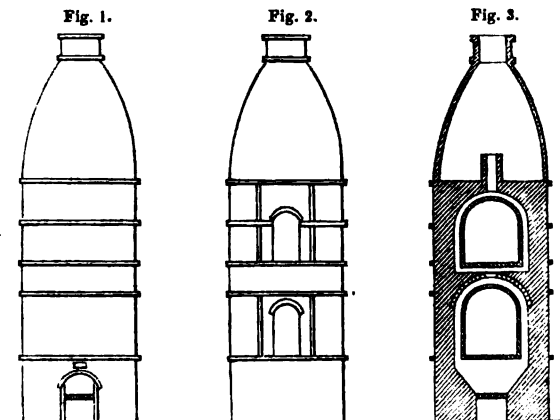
, is a front elevation ; fig. 2, a back elevation ; and fig. 3, a vertical section of two kilns or ovens, constructed according to this invention.
